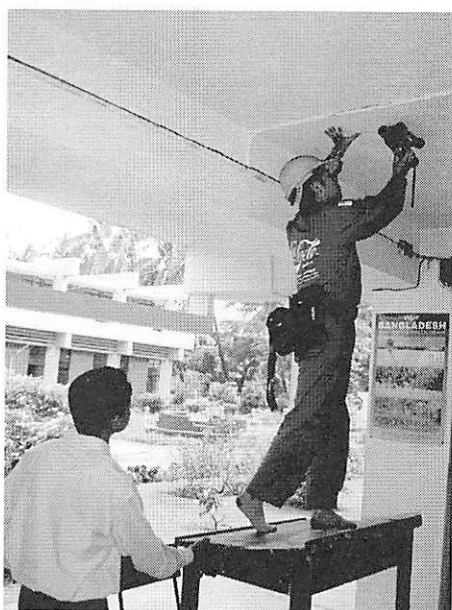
(a) Slab reinforcement detection with Ferroskan at Titumir hall.
